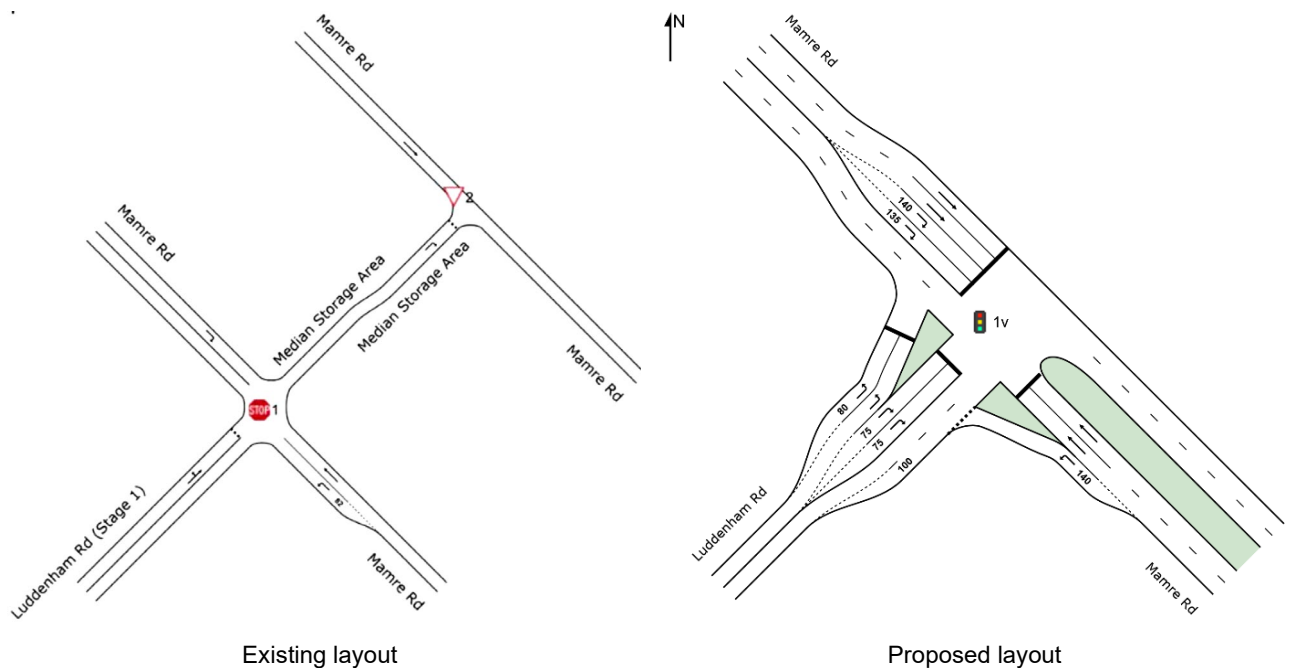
Existing and indicative intersection layout at Luddenham Road
